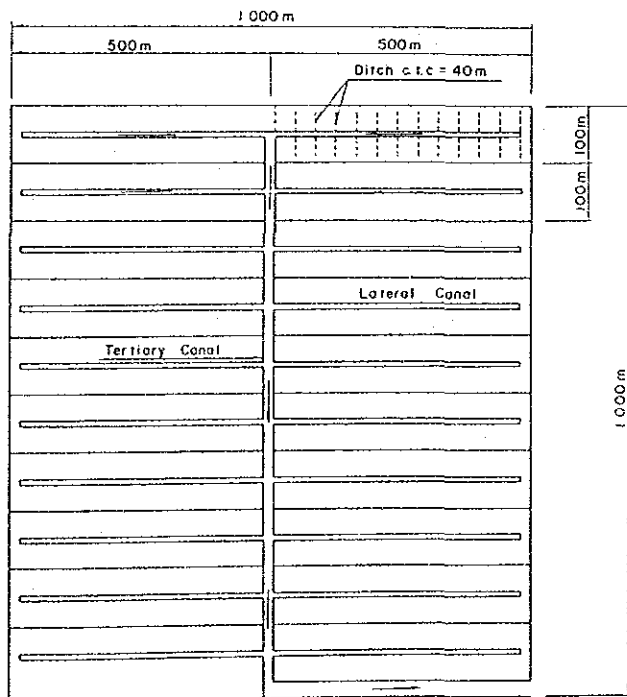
Standard Layout of Field Block in Banana Plantation
